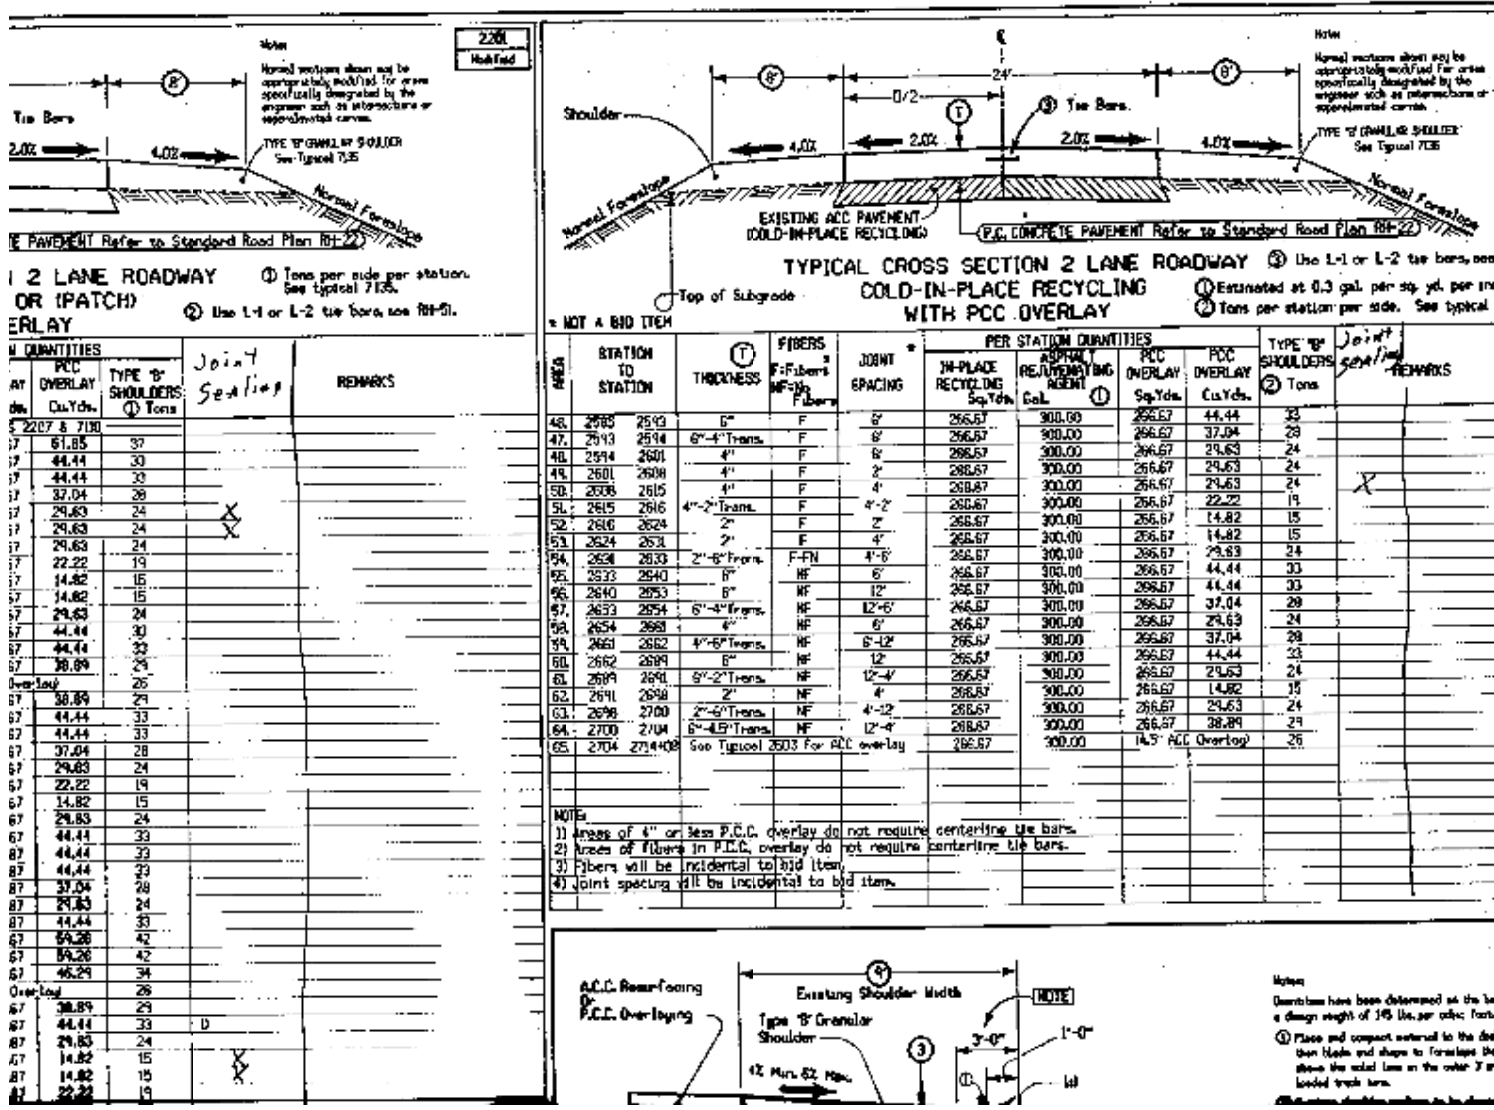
Typical cross section cold in place recycling with PCC overlay
